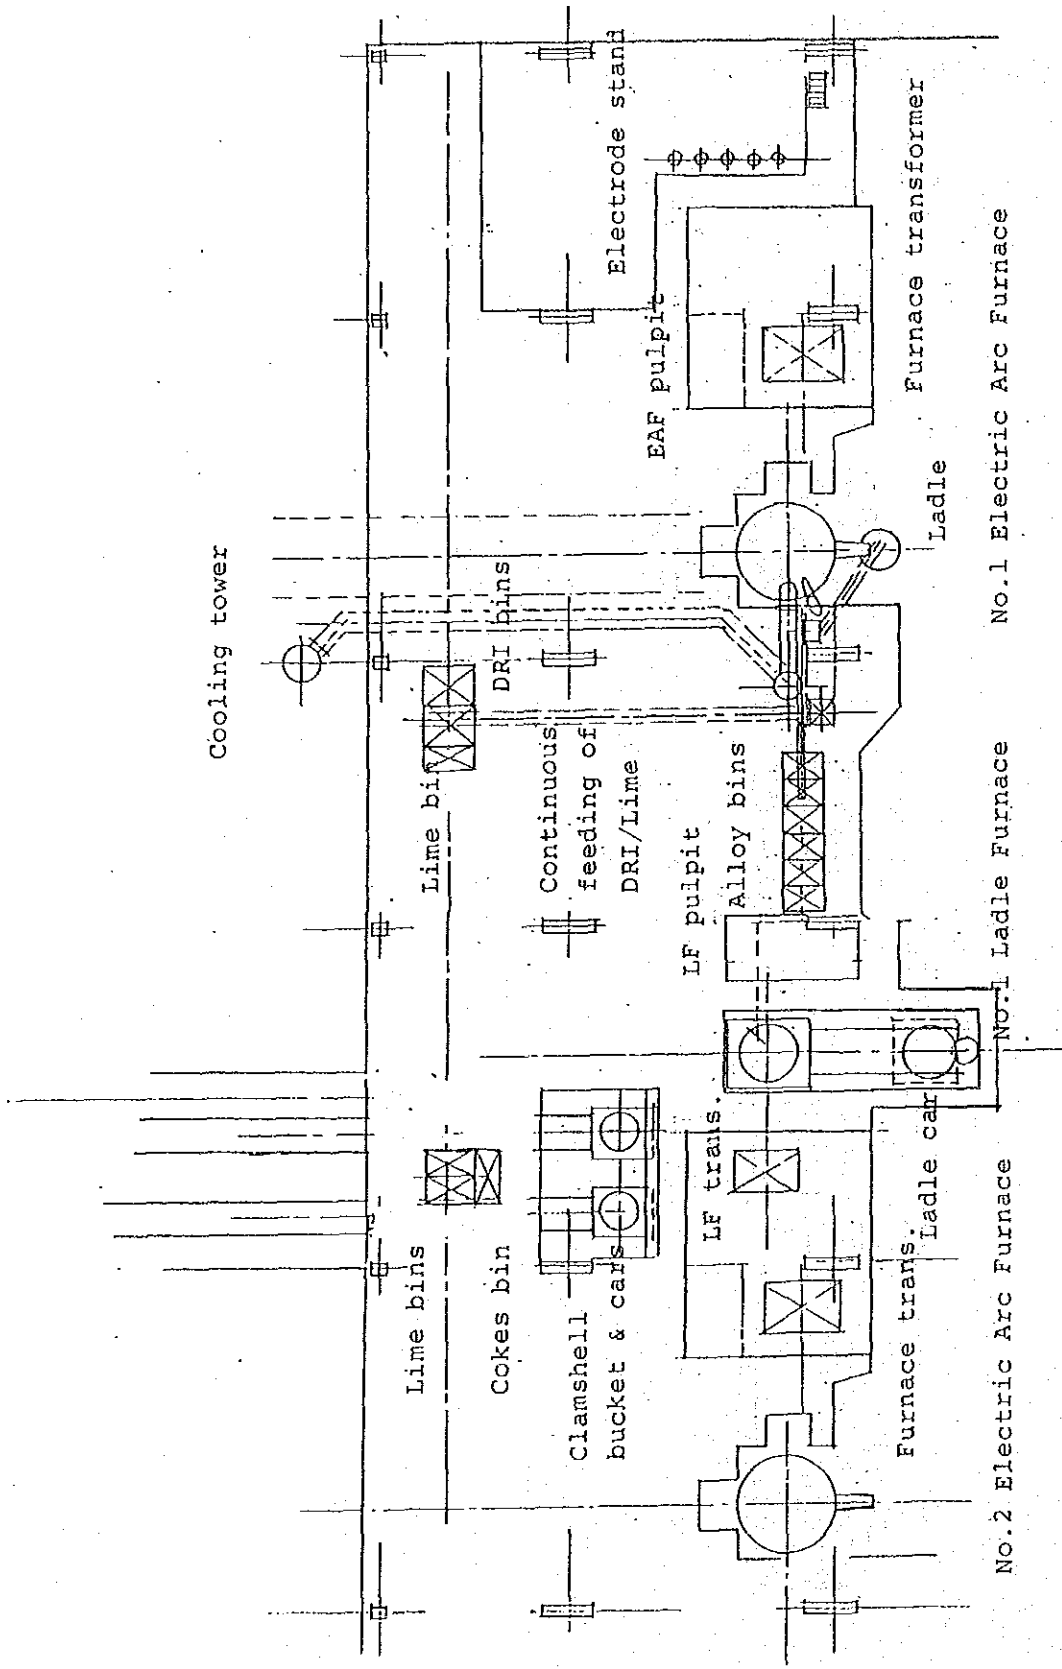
The Layout Arrangement of Furnace Bay
